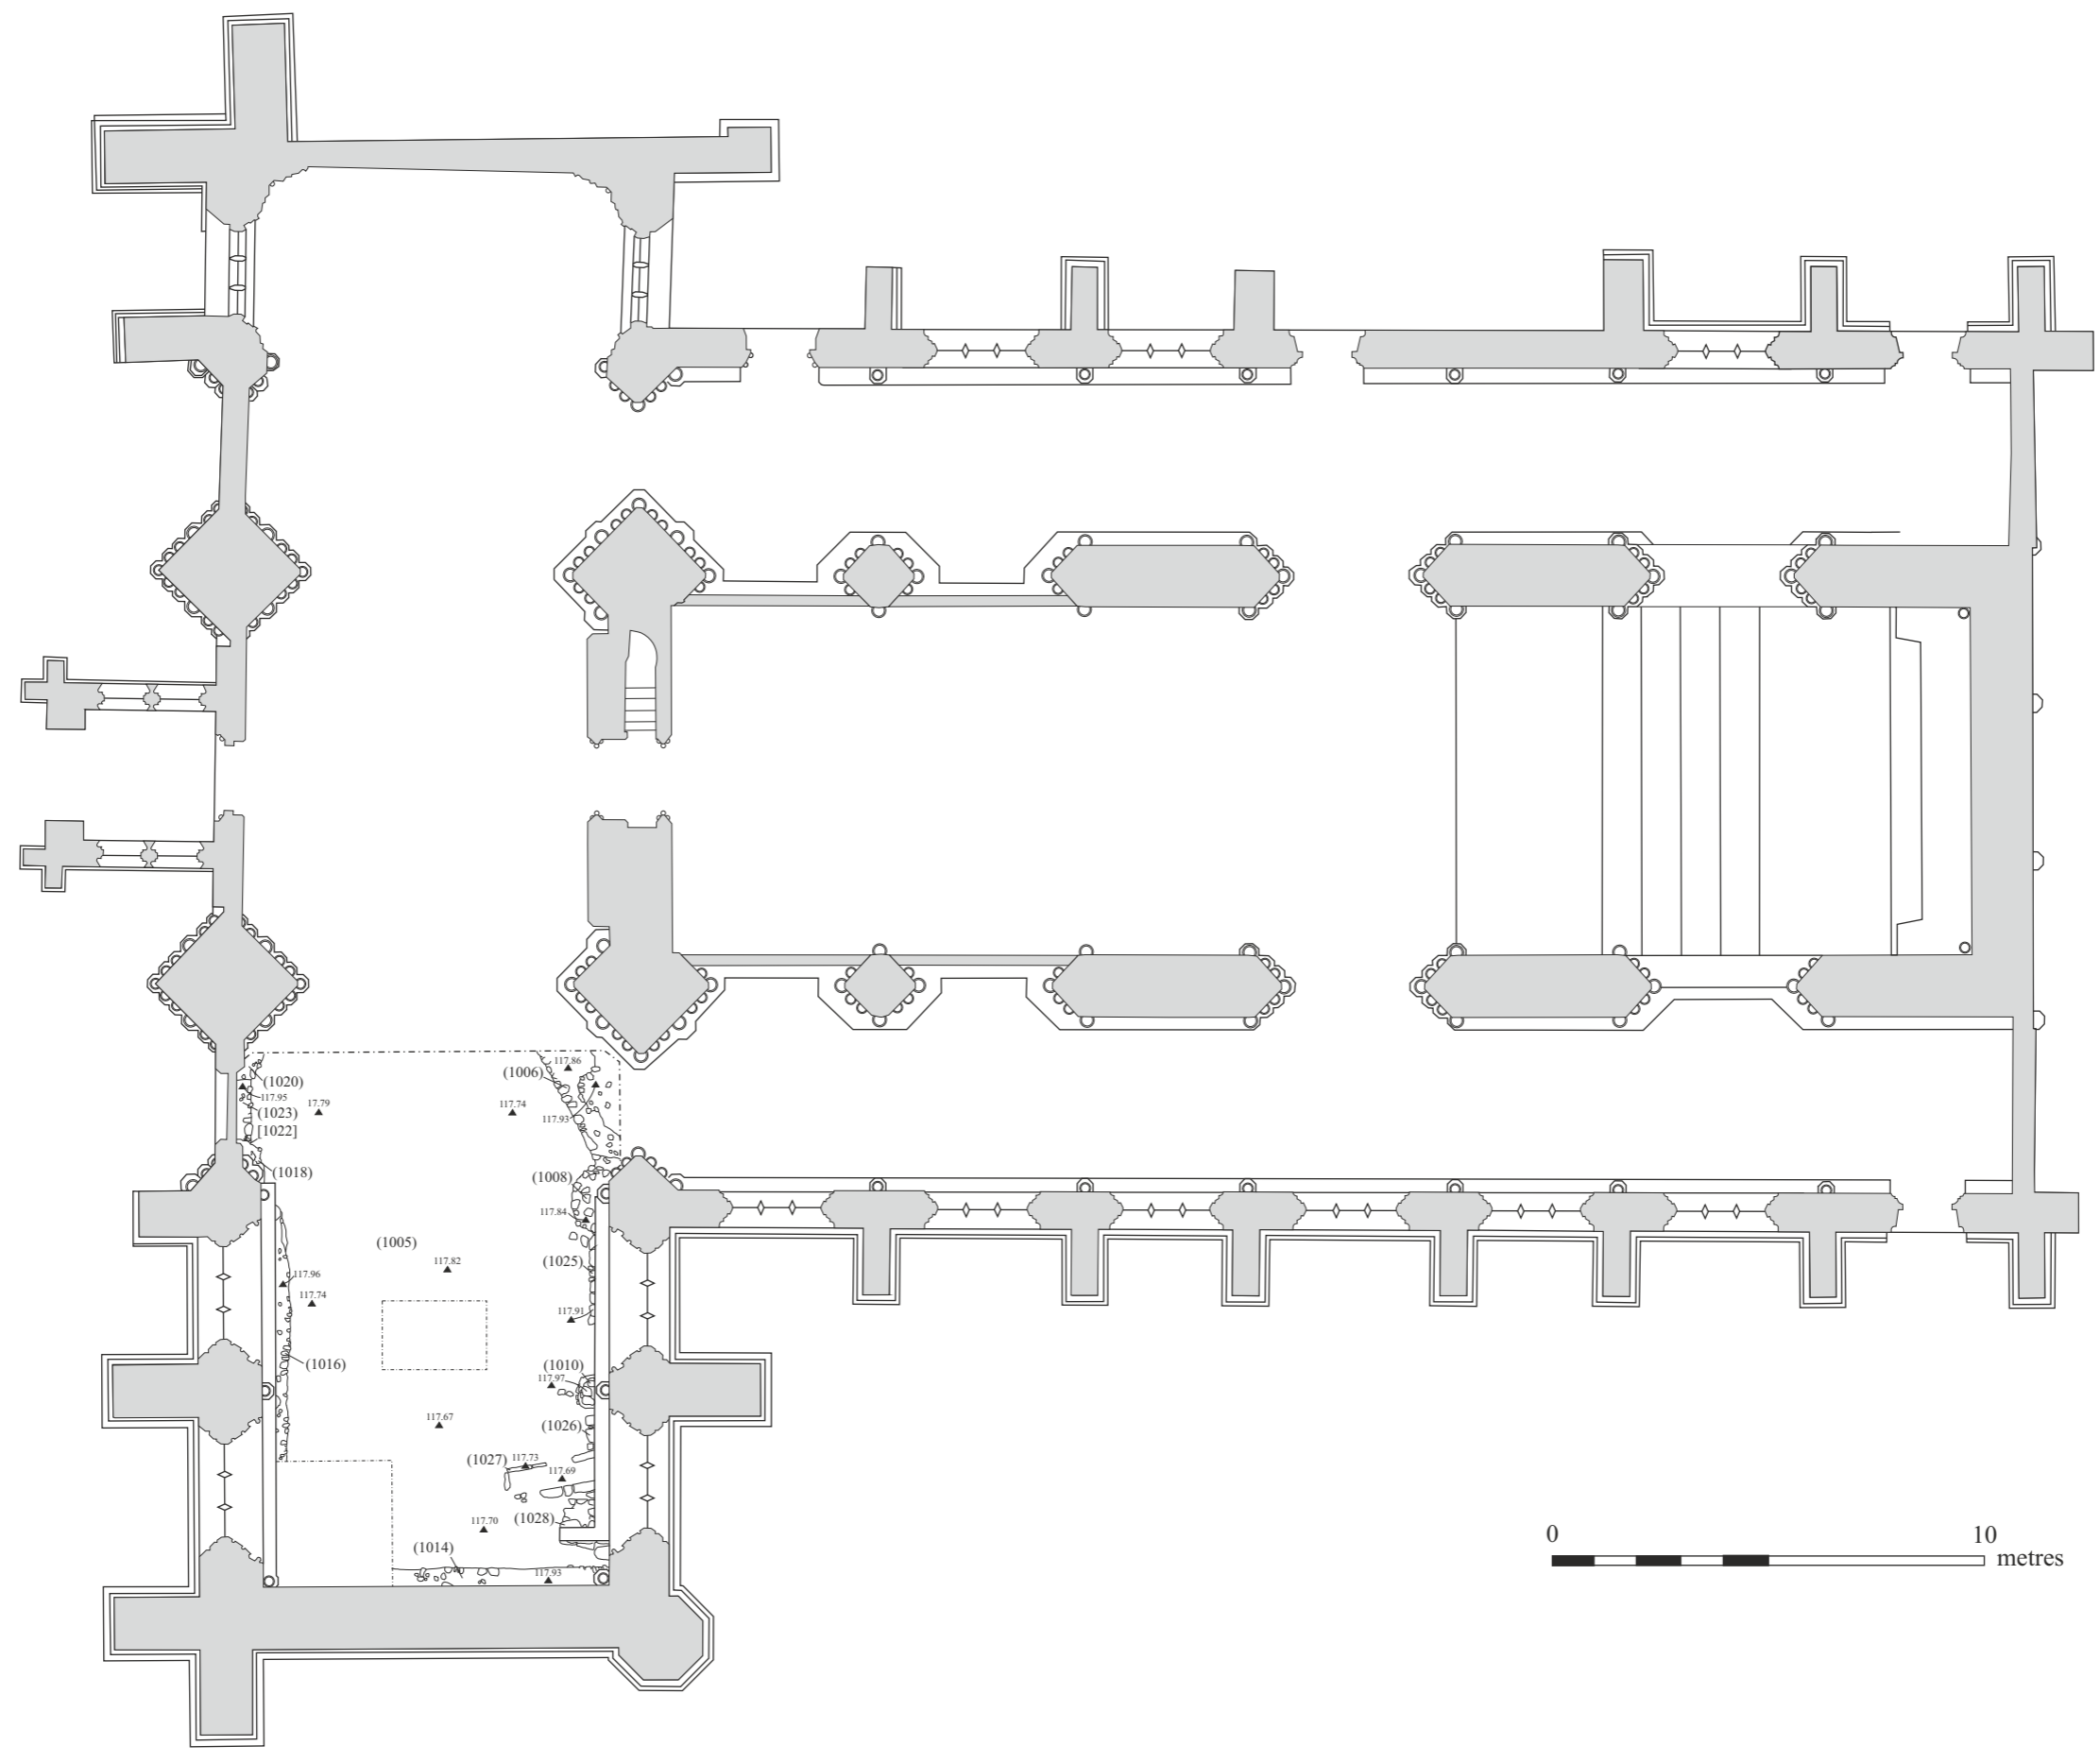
Plan showing layout of the John Gilbert Scott flooring.
